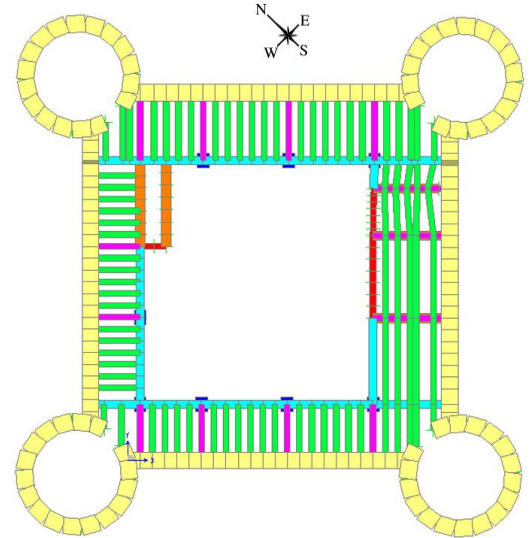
Proposal plan for the reconstruction work of the citadel building (Section Plan at level +1.50).
